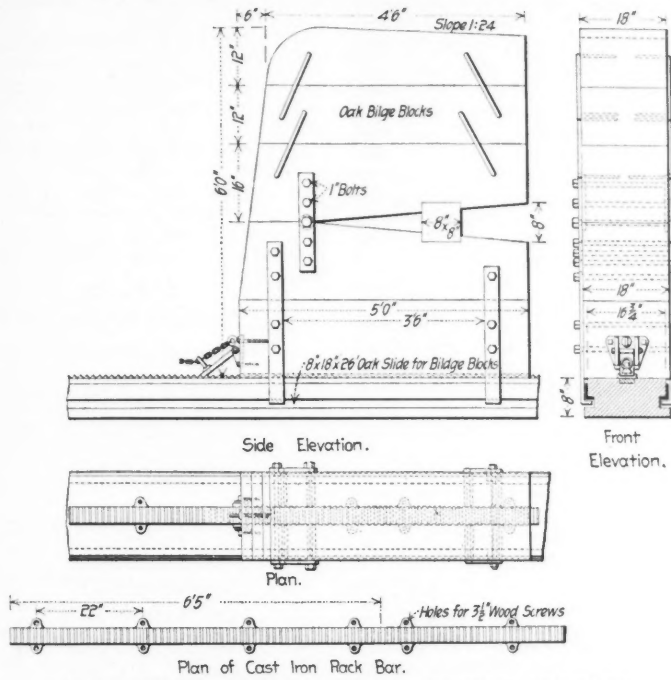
DETAILS OF BILGE BLOCKS, BOSTON DRY DOCK.
